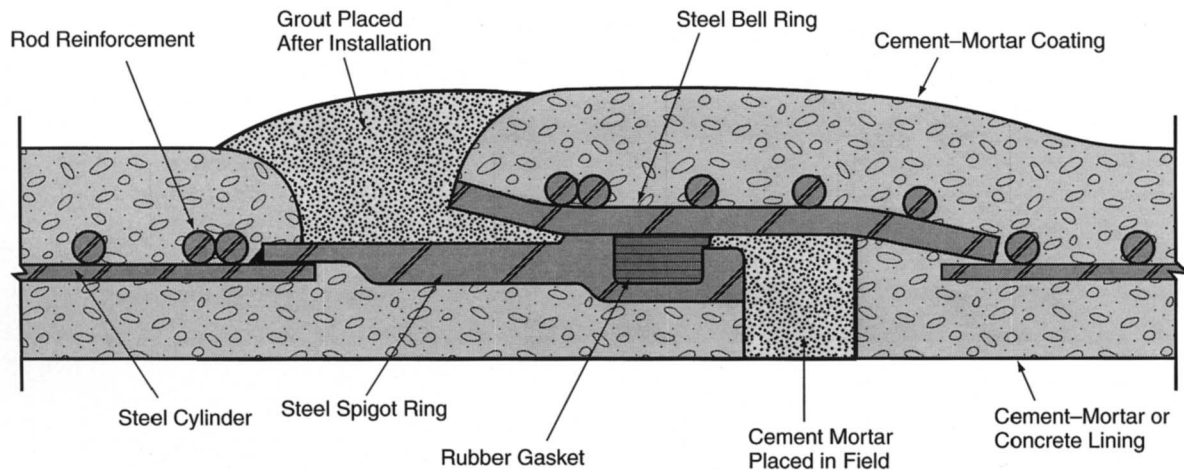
Bar-wrapped concrete cylinder pipe (AWWA C303-type pipe)
